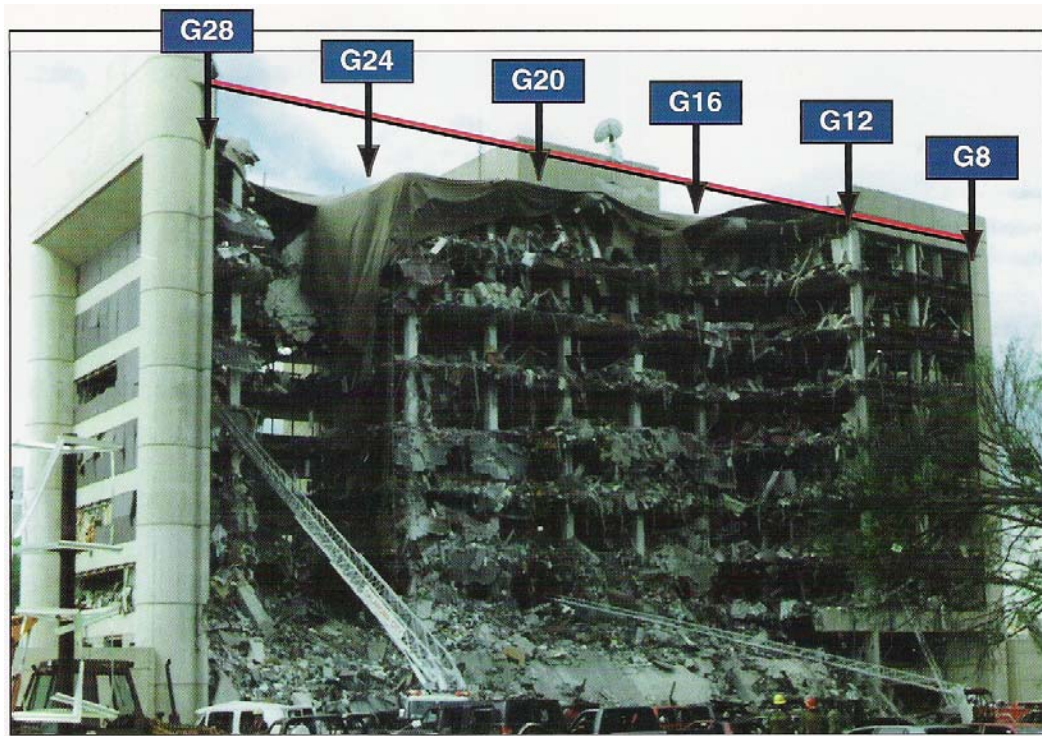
Damage to North Elevation of Murrah Building (FEMA 1996)
